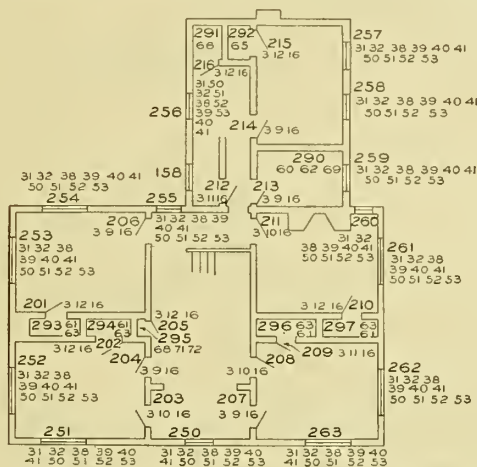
Second-Floor Plan, with Hardware Items Indicated.
